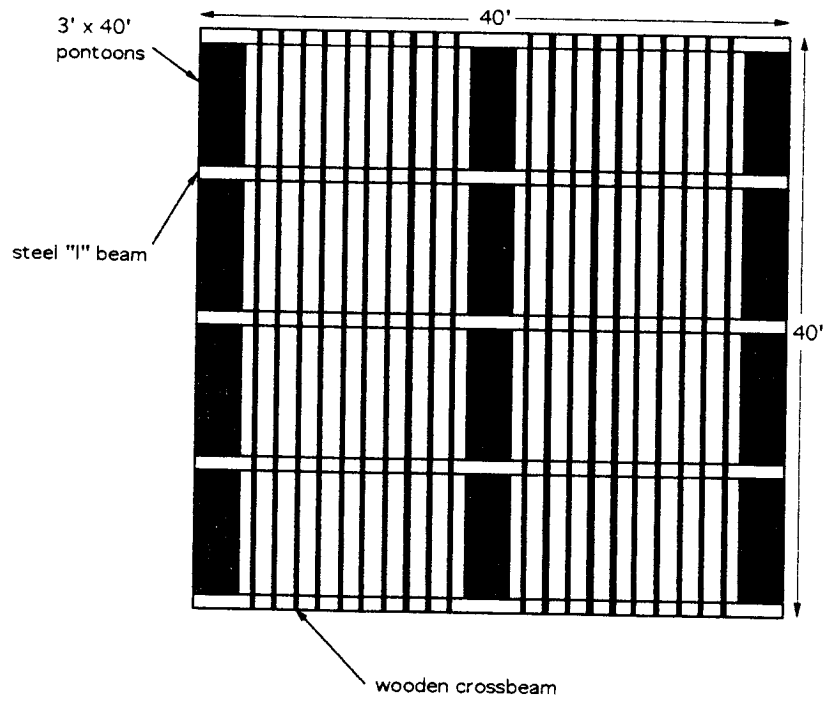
Plan view of a single 40' x 40' mussel raft. The foam-filled polyethylene pontoons are secured to one another by galvanized steel beams. Wooden crossbeams running parallel to the pontoons support the droppers.
